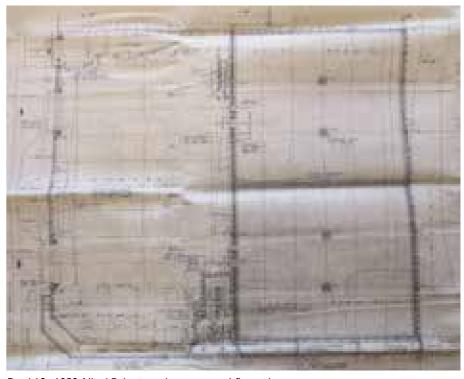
1958 Allied Bakeries scheme, ground floor plan.
